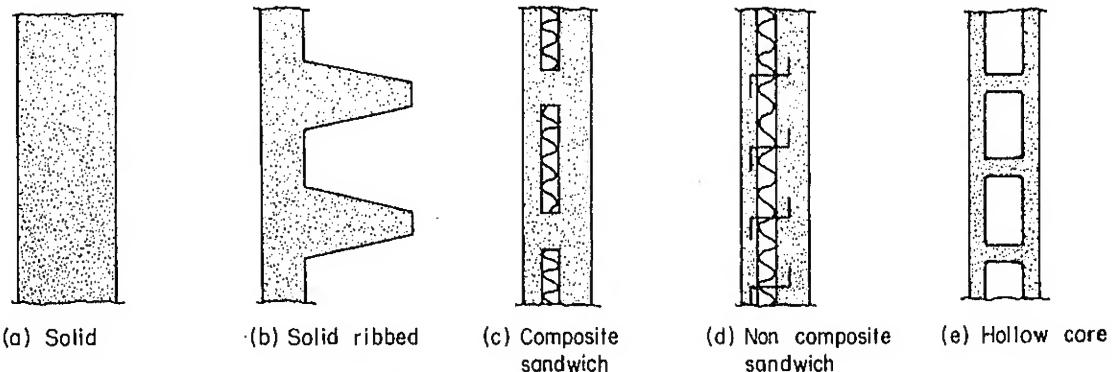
Typical Sections of Structural Wall Panels Used in Current Practice
